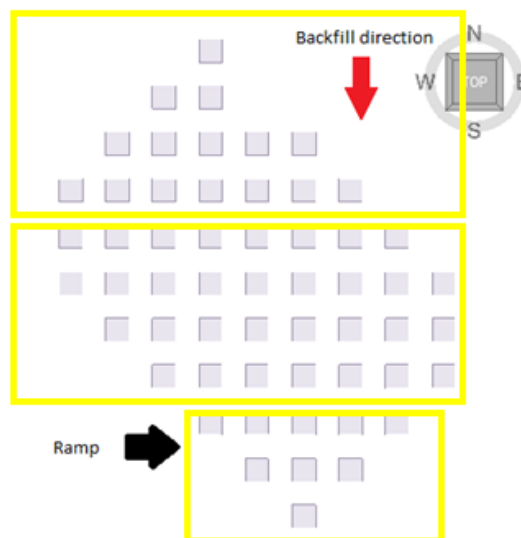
First layout of the room and pillar excavation backfill direction (N-S), ramp access and the three operation areas.
